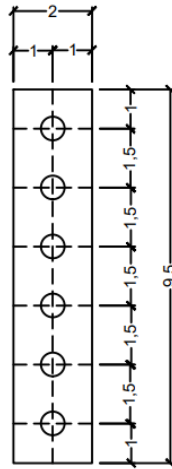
Abutment 2 Redesigned Foundation Site Plan
